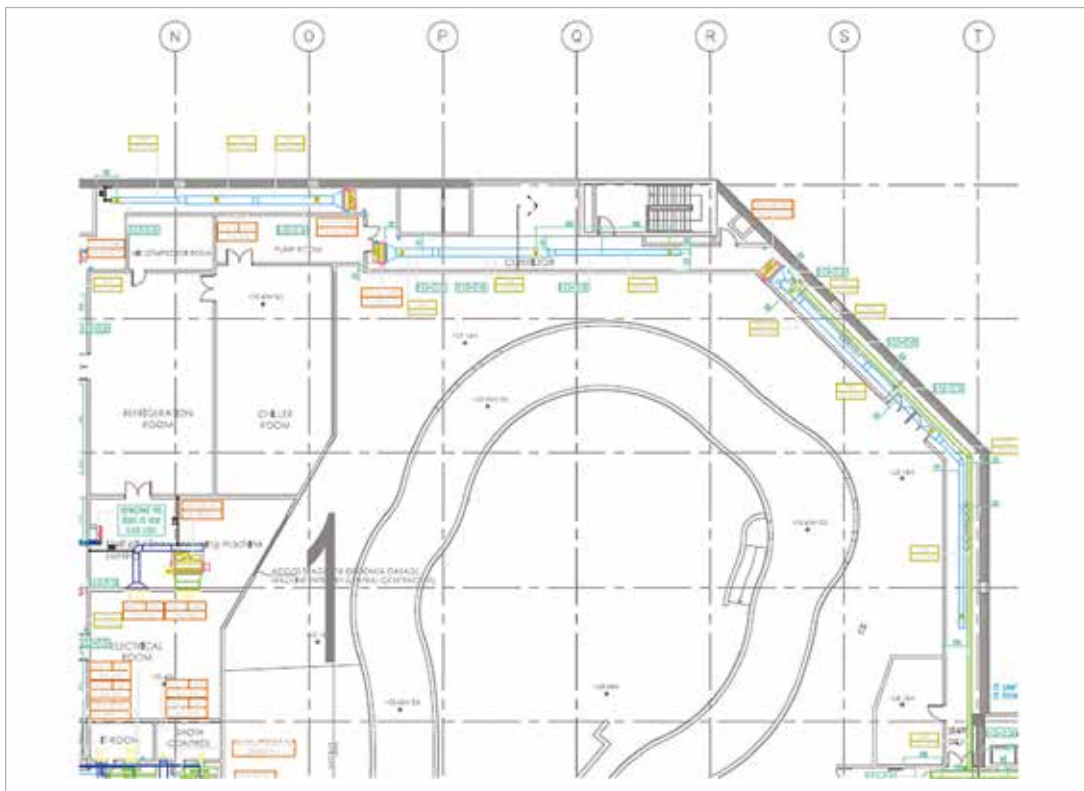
Vendome Mall Ground Floor Snow Park Corridor Area
